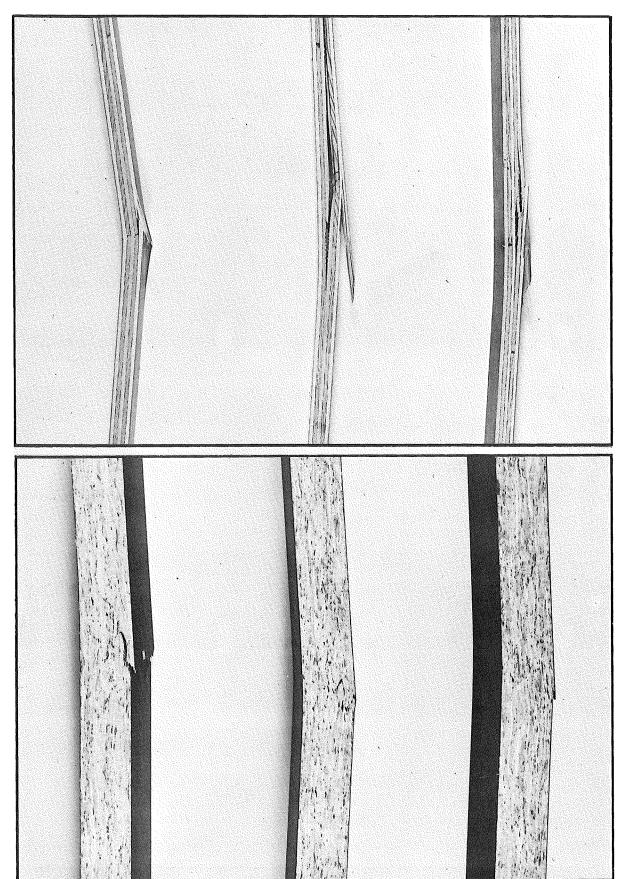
Typical static bending test failures of dry-condition specimens, with fiber board at left, and plywood at right.
